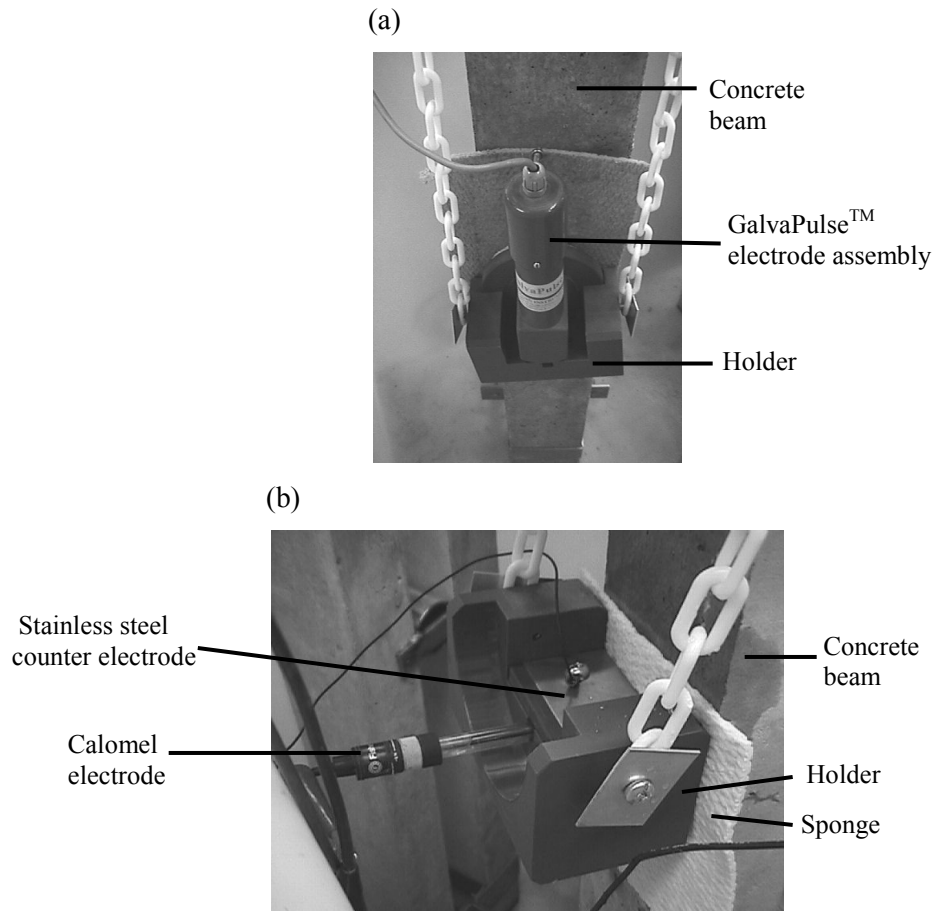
The holder used to hold (a) the Galvapulse™ electrode assembly and (b) the calomel and counter electrodes for LPR measurements.
